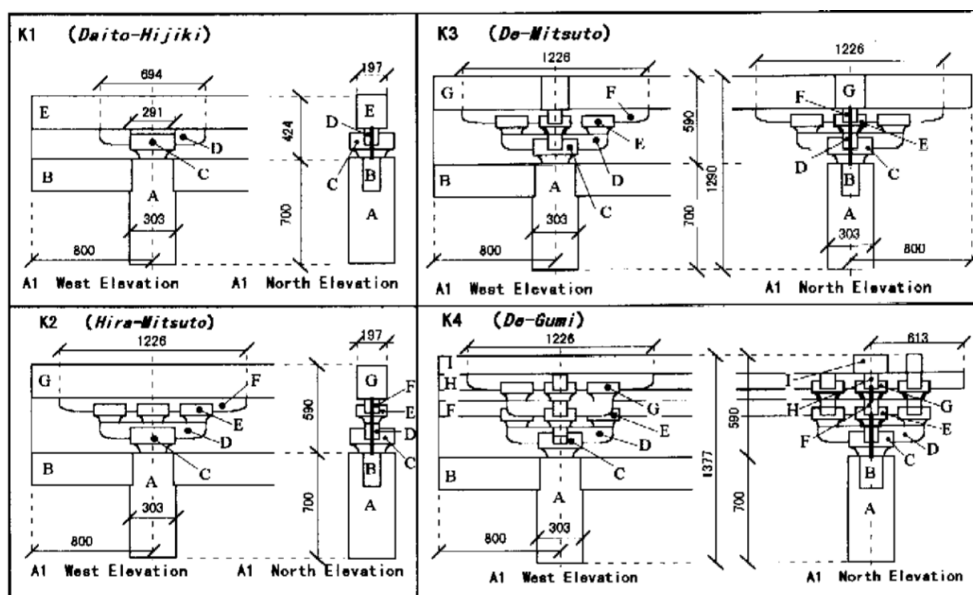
Elevations of 4 specimens (Fujita et al., 2000)
